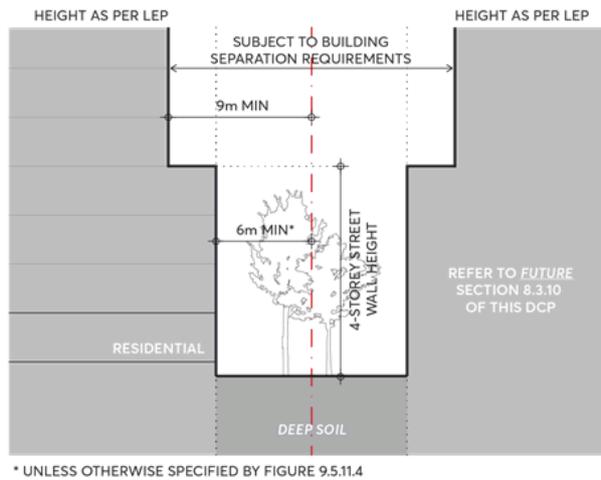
Setbacks and Street Wall Height to boundary shared with mid-block properties to the east (Section G)
